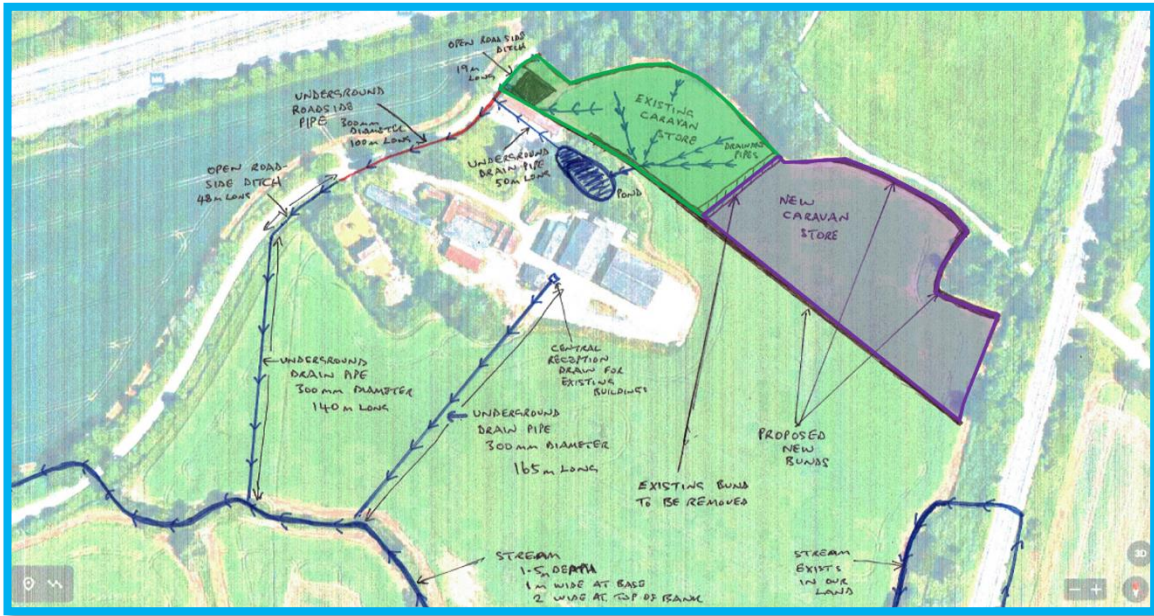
Proposed site plan showing new caravan store in northeast of farm site in context of existing infrastructure.
